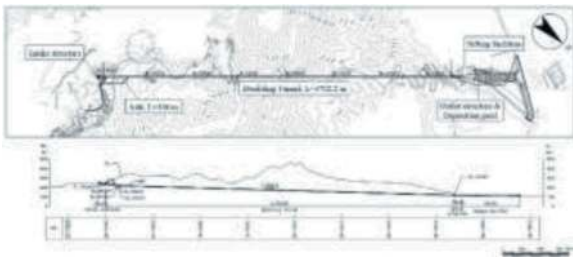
General layout of dedilting tunnel at shihmen reservoir.
